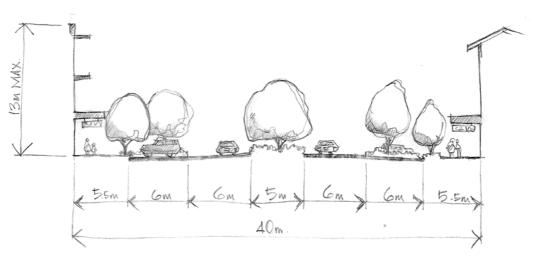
Cross Section of Ocean Avenue in Village Centre
